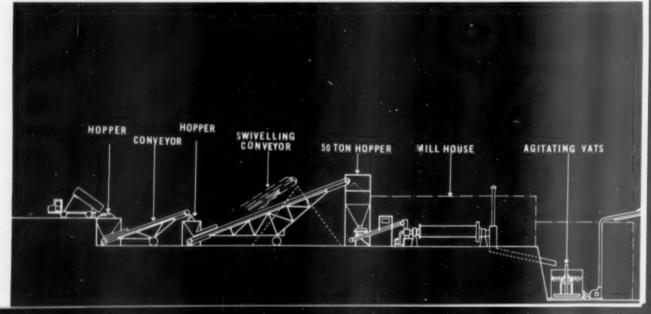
Layout of quarry, slag slurry mills and tanks, and batching plant with relation to Moriston Dam project
